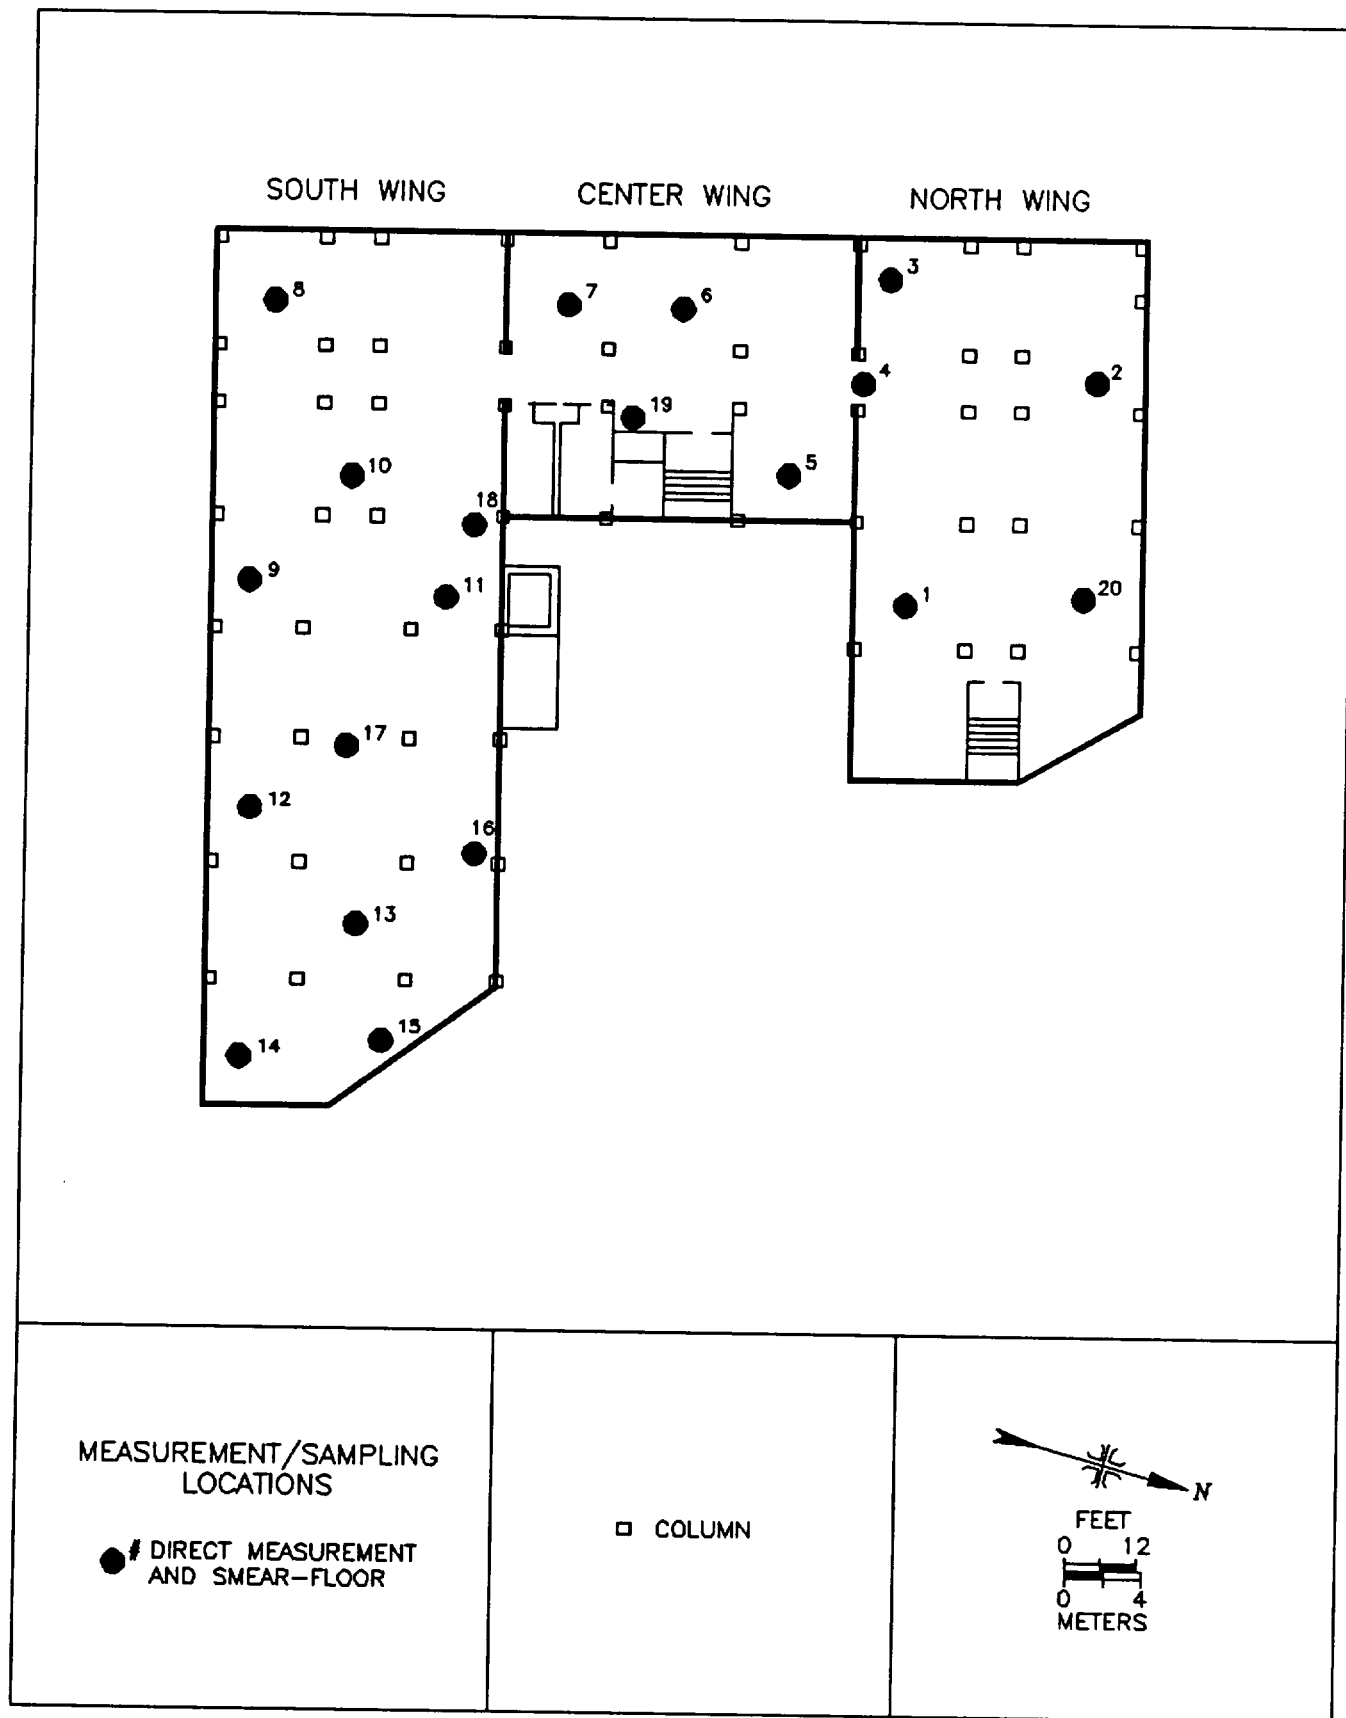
Building 7, Fifth Floor — Measurement and Sampling Locations
